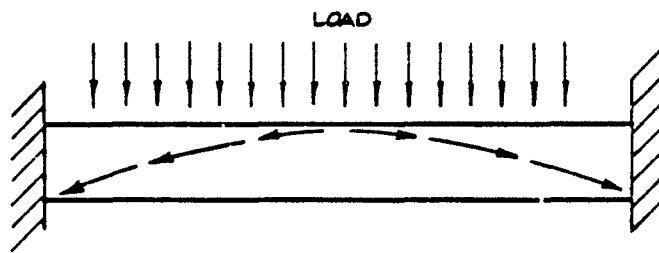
shows a typical slab element that may be applicable either to a flat plate system where the element is bordered by the column lines, or to a two-way slab system where this slab element is bordered by the beam lines. The sequence of behavior under increasing levels of vertical load is given in Figure 3:
